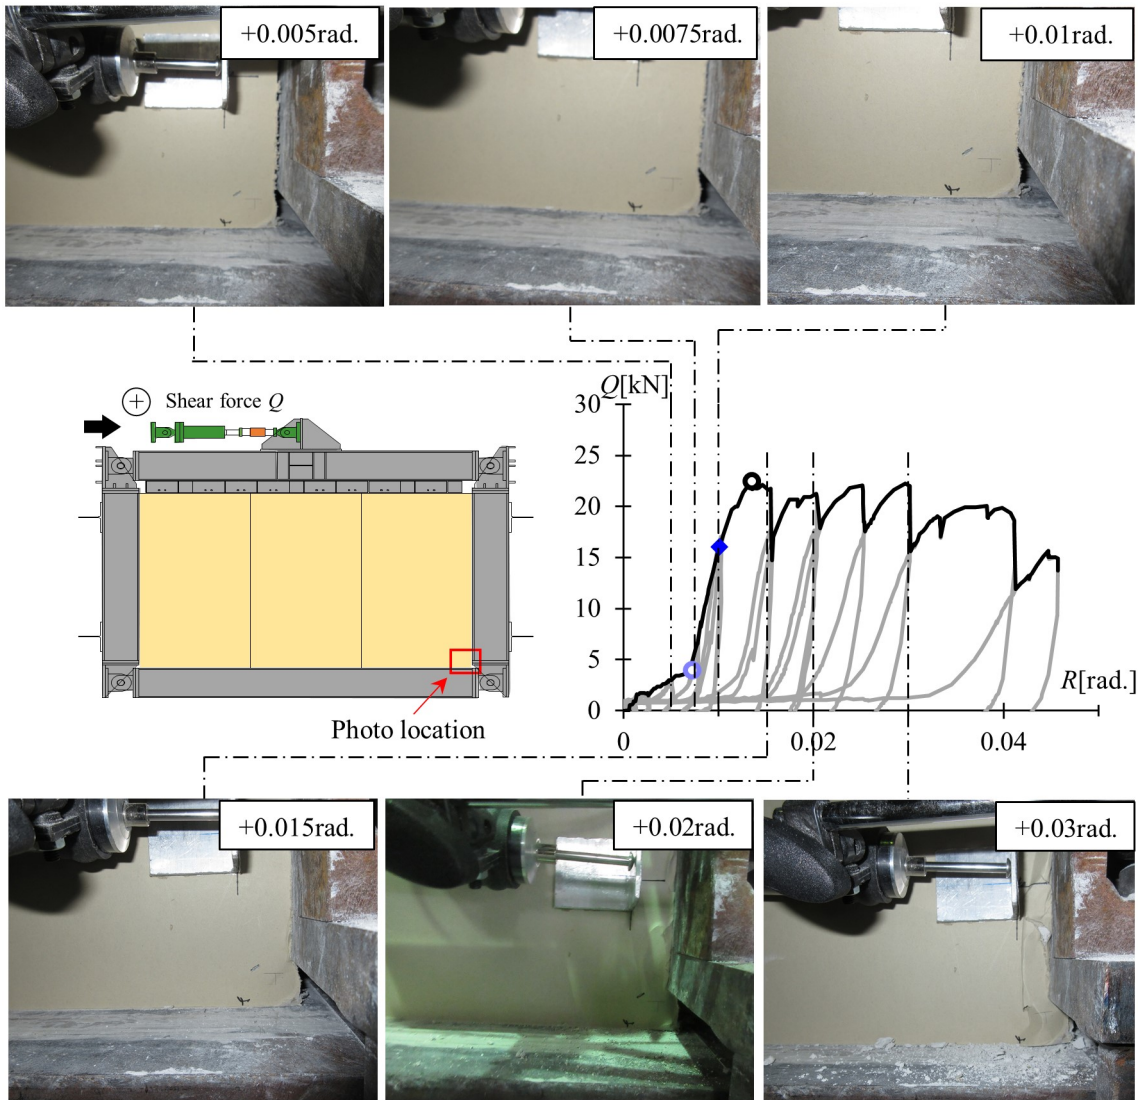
Damage to the gypsum board at loading cycle from 0.005 rad to 0.03 rad (Specimen S12.5\*2, lower right corner).
